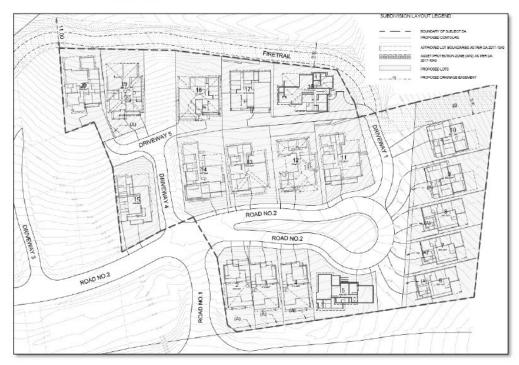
Proposed Site Layout Plan Extract with Dwellings
